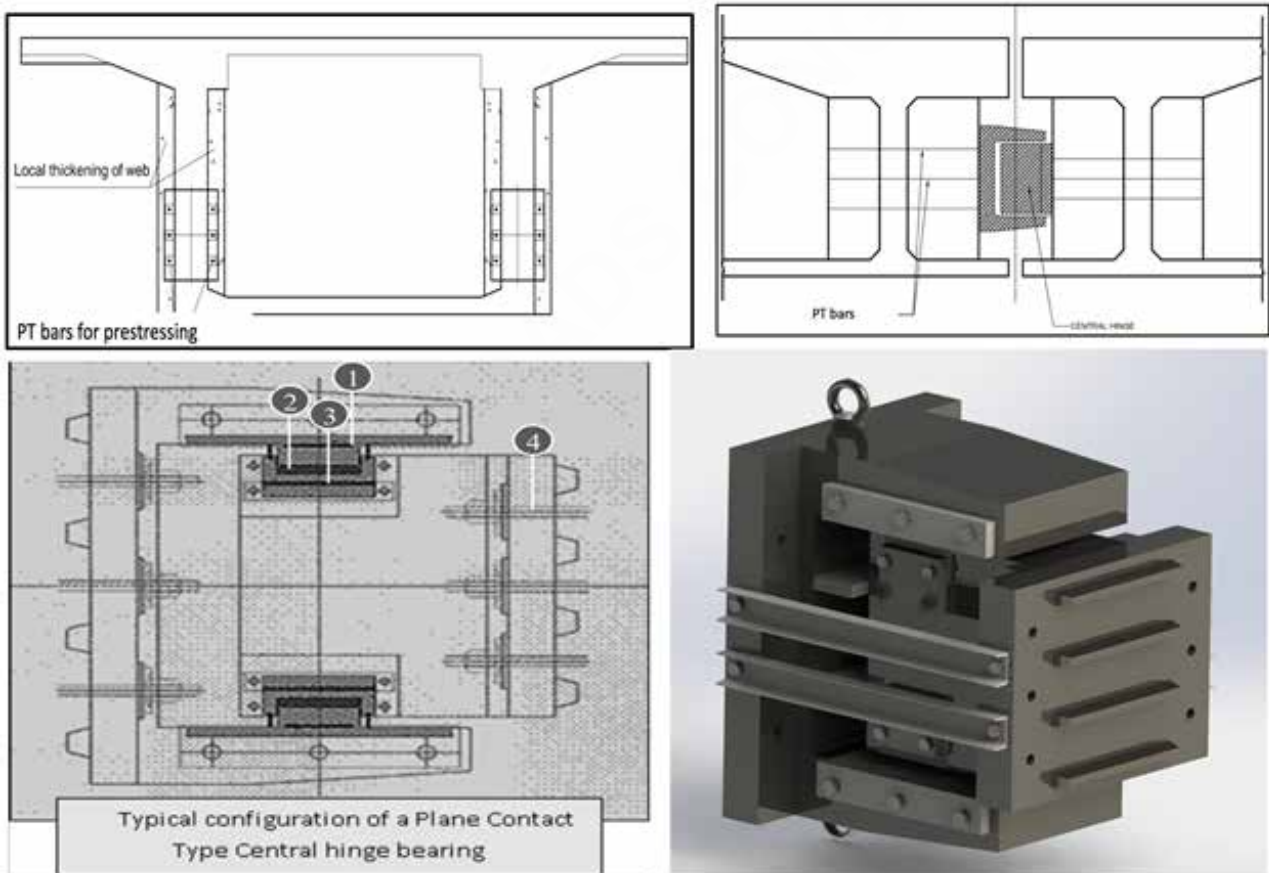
Plane Contact CHB (Central Hinge Bearing) [2]
